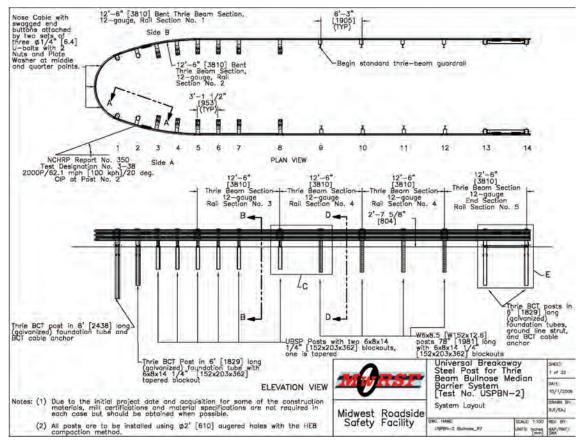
Barrier Design Detail of UBSPN-2 (14).
